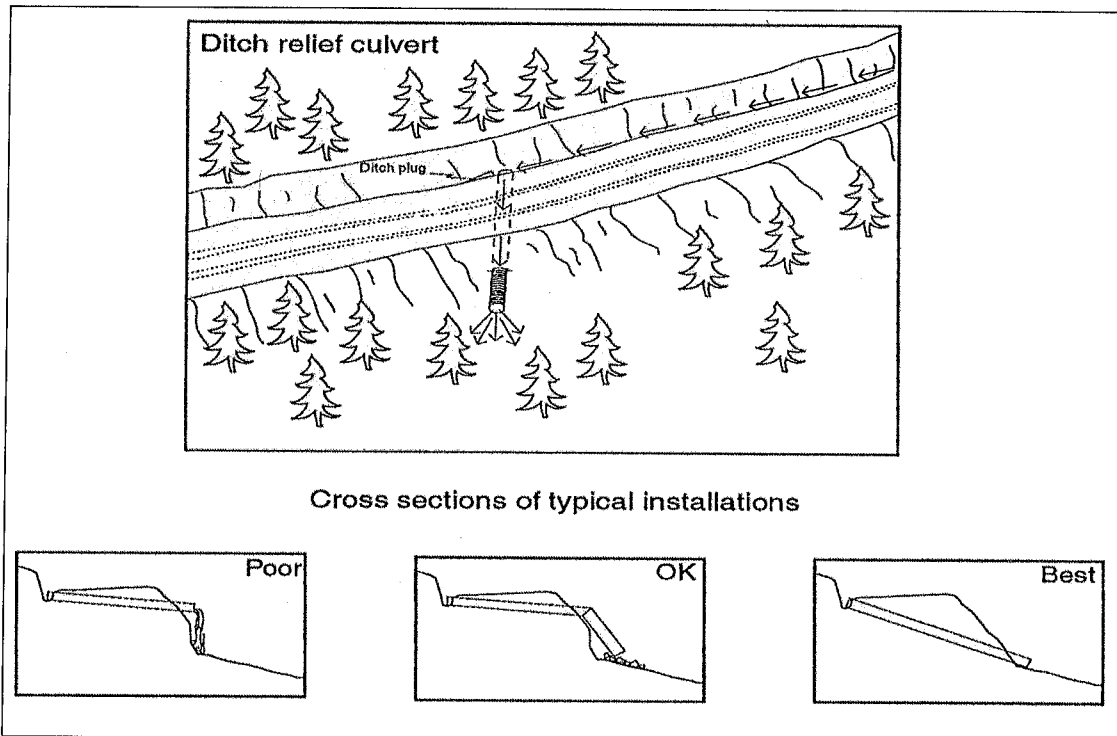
Typical ditch relief culvert installation. (CDFG, 2006)
